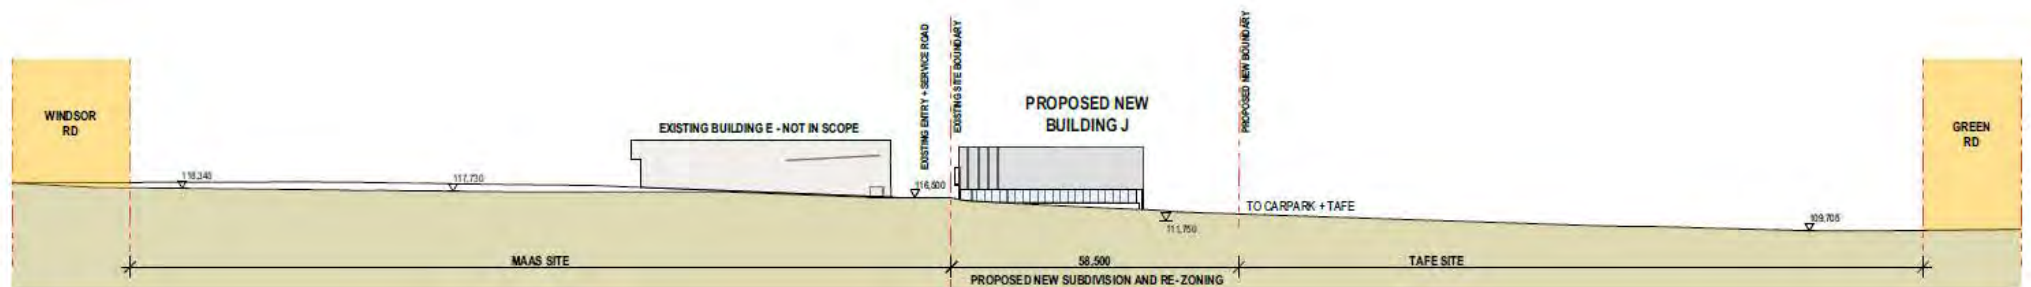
Proposed Site Plan Street Elevation (Lahznimmo Architects, DA1101, Rev.12, 7.08.2020)
